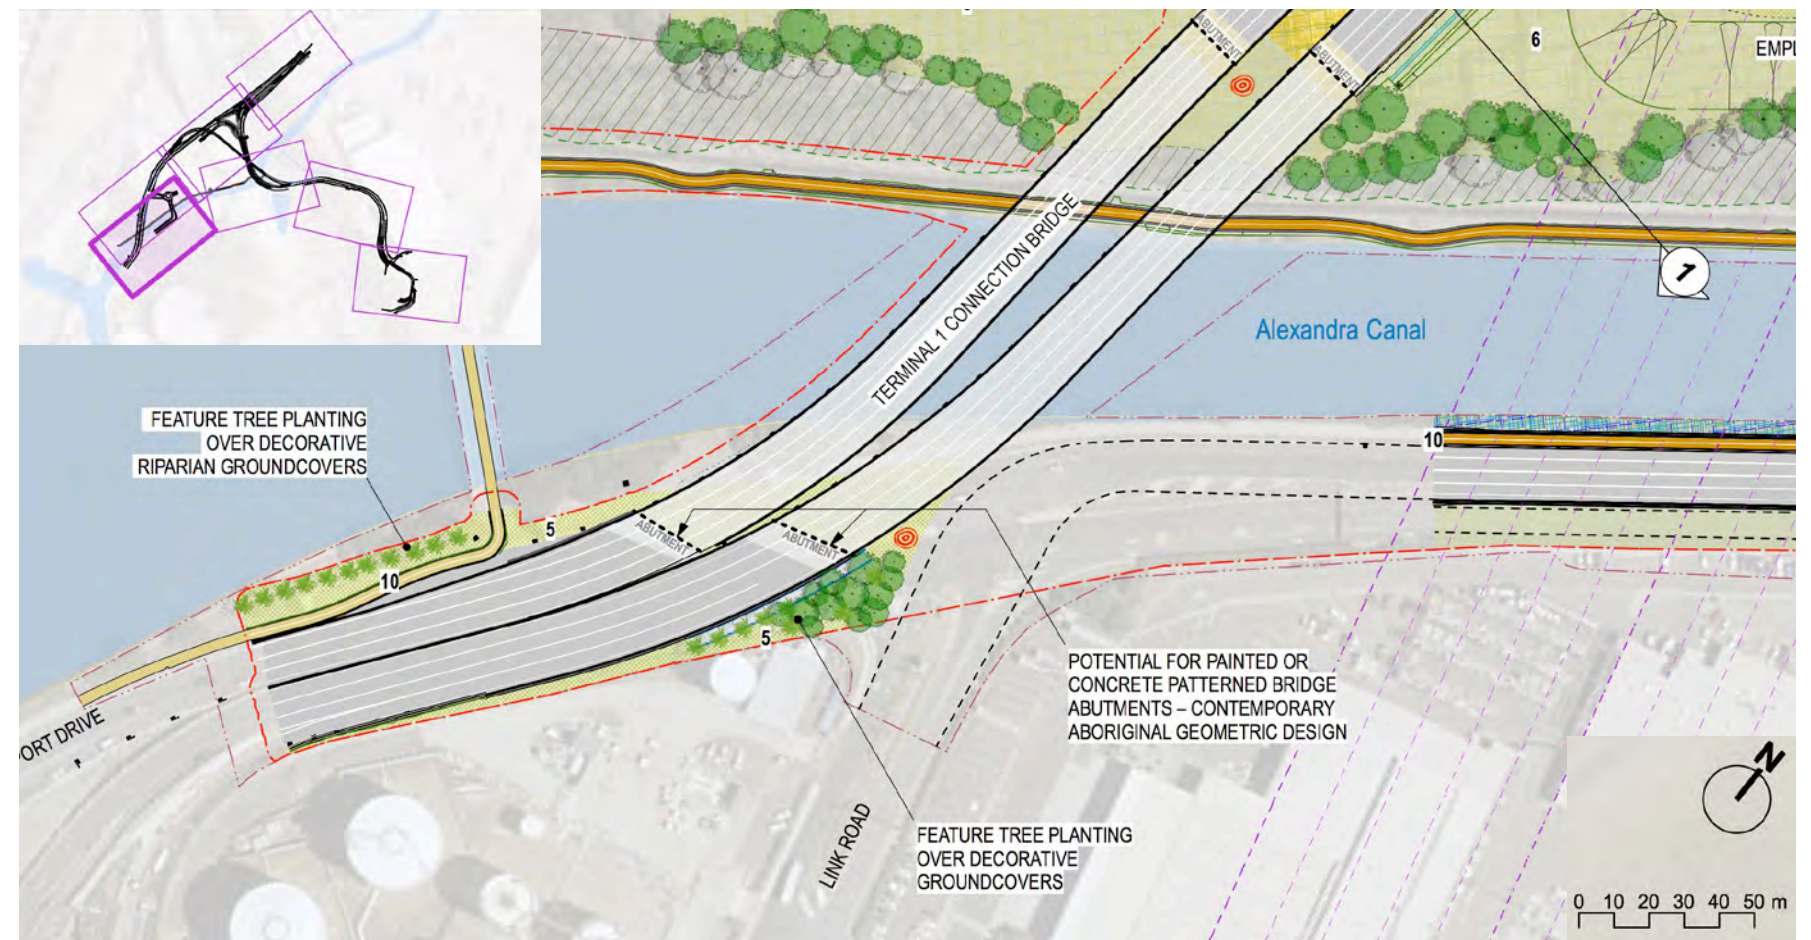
Urban and Landscape Design Concept plan – Precinct 1: Terminal 1 interface
